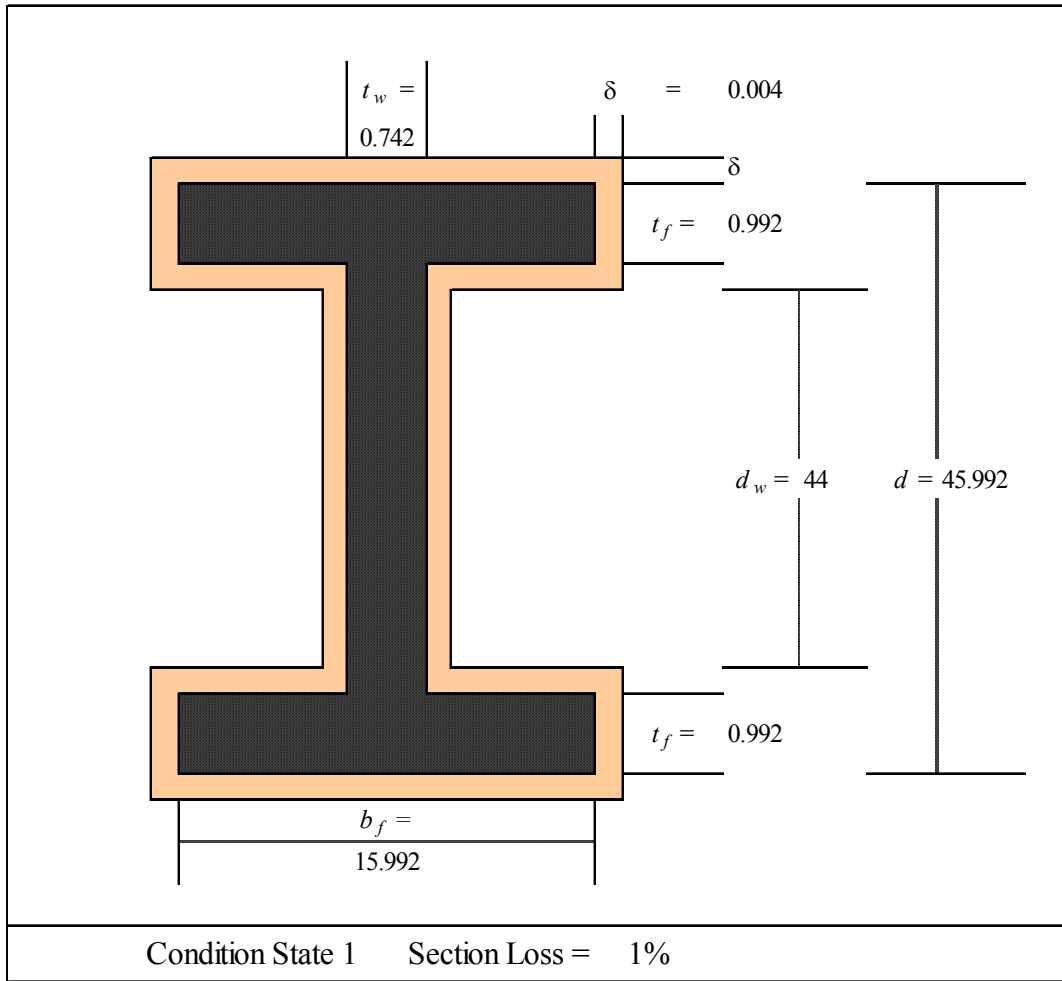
Dimensions of Steel Girder Cross-Section in Condition State 1
